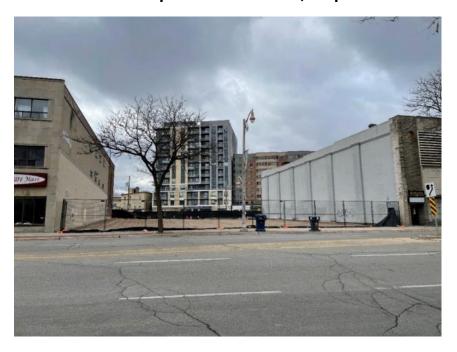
Wyndham Street; areas within 20 metres of Public Burying Ground require construction monitoring
